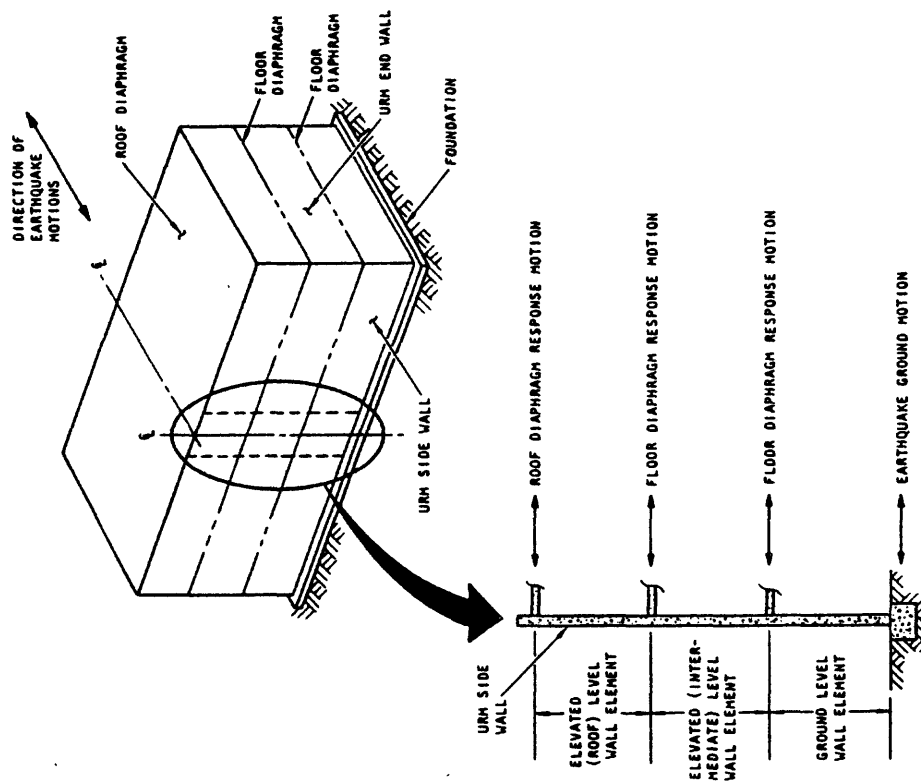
WALLS, OUT-OF-PLANE, MULTI-STORY BUILDING
